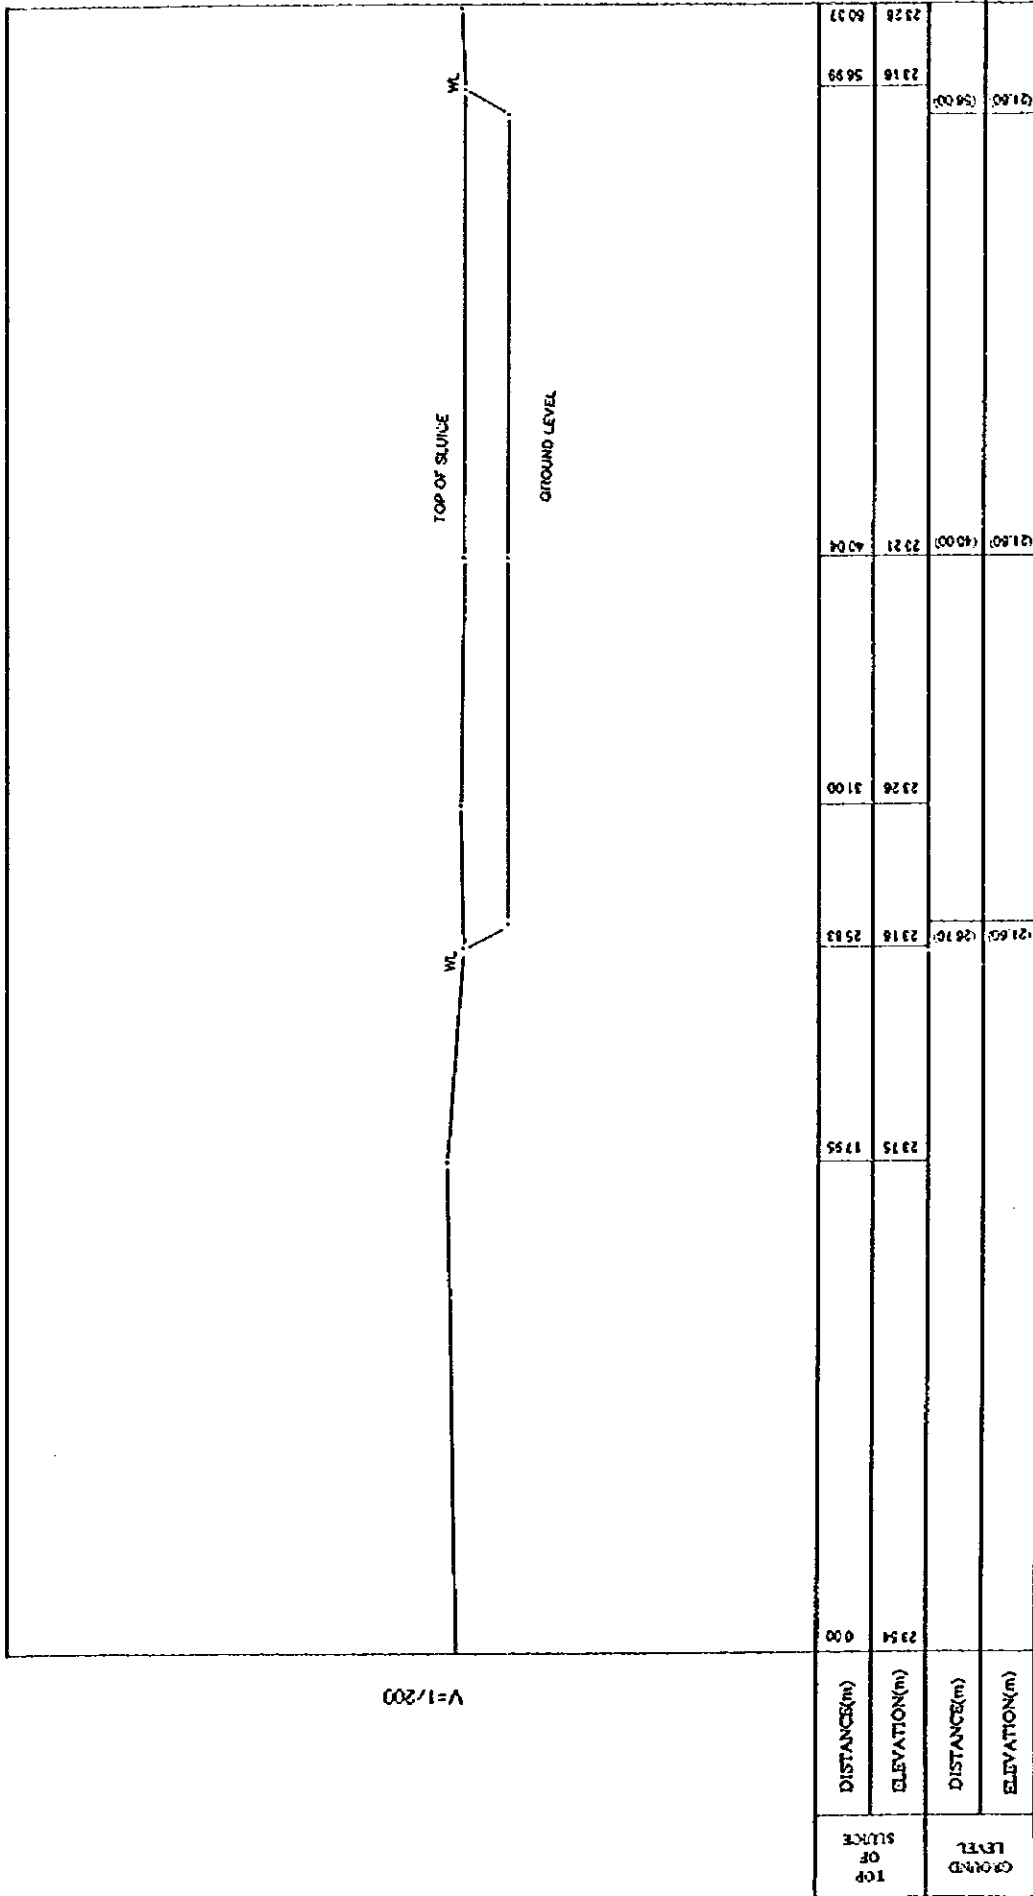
JOCOTAL DRAINAGE CULVERT (2/2)
